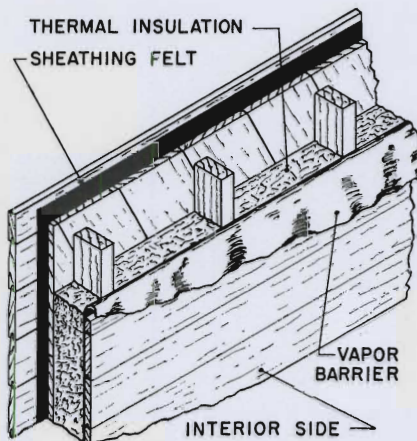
Proper installation of a vapor barrier in an insulated wall.
